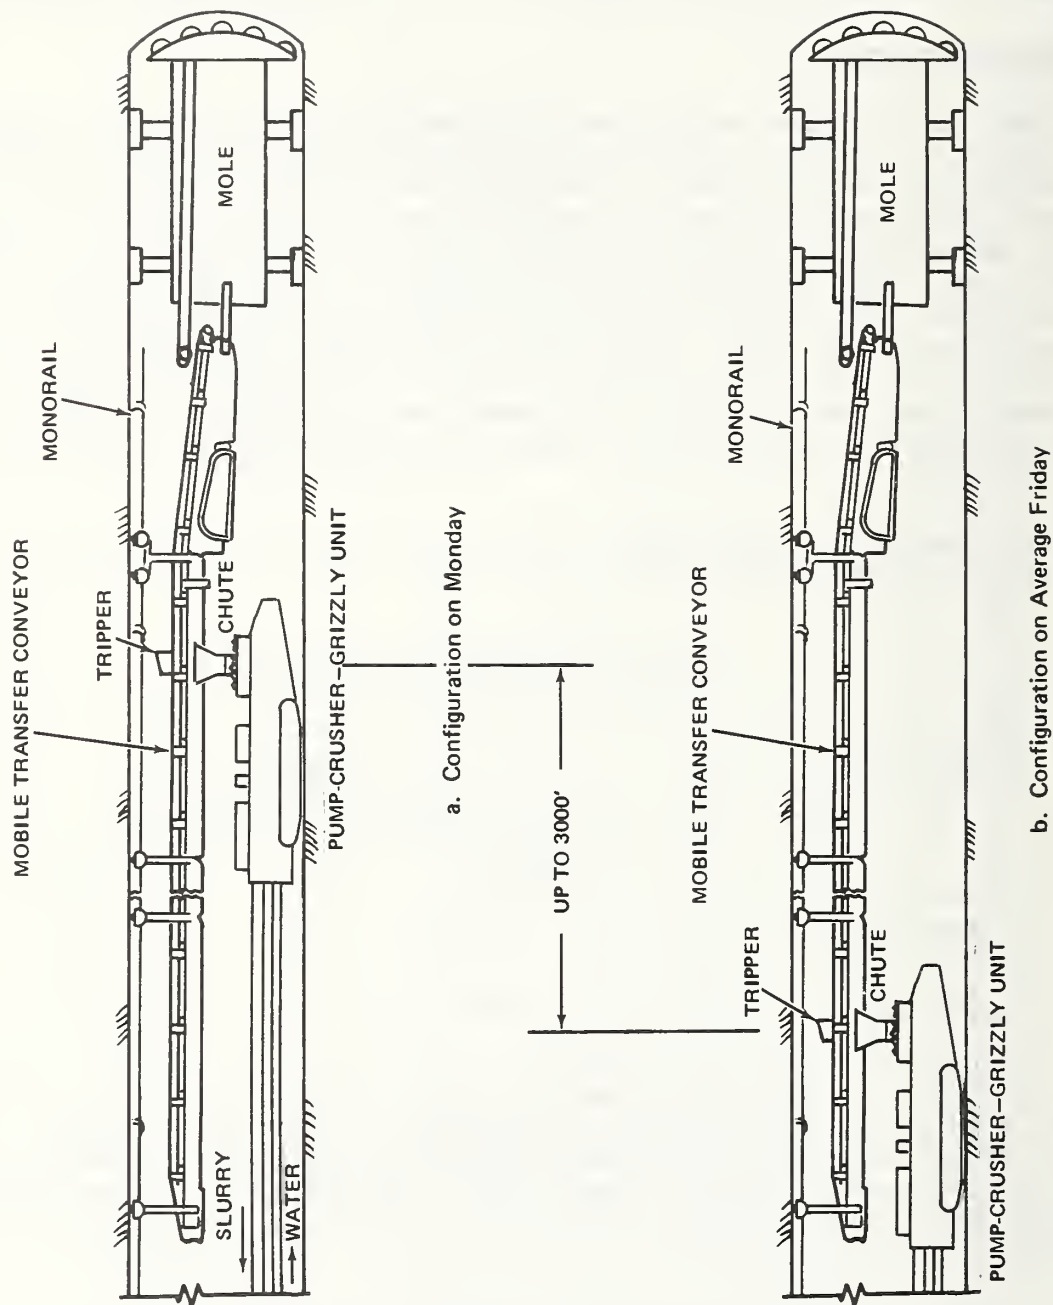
EXTENSIBLE CONVEYOR FEEDING HYDRAULIC SYSTEM
